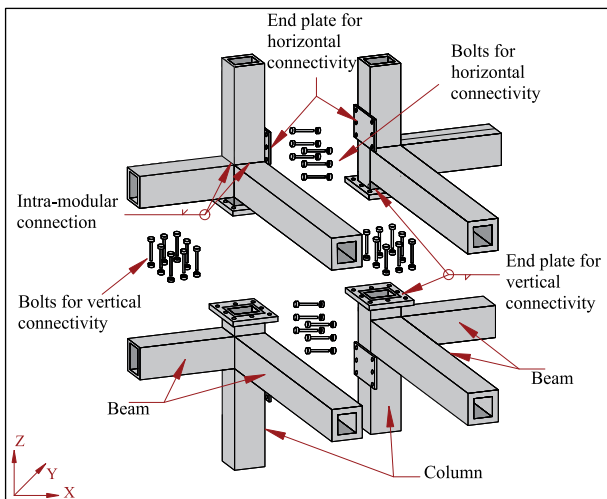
Detail of horizontal and vertical inter-connection used by Styles et al. [7].
